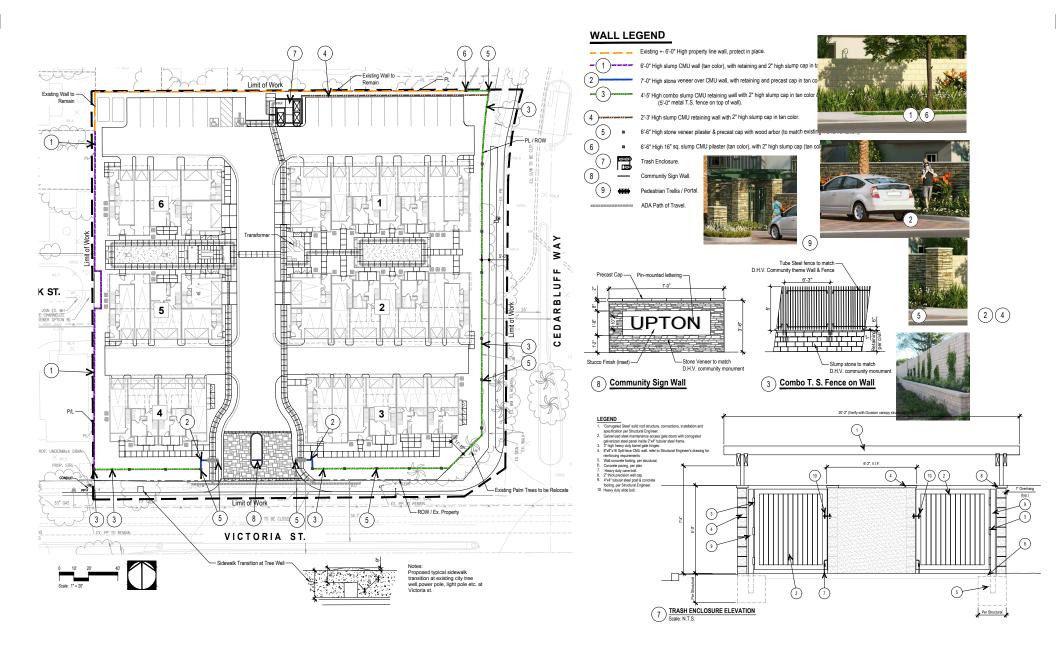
SCHEMATIC WALL AND FENCE PLAN
